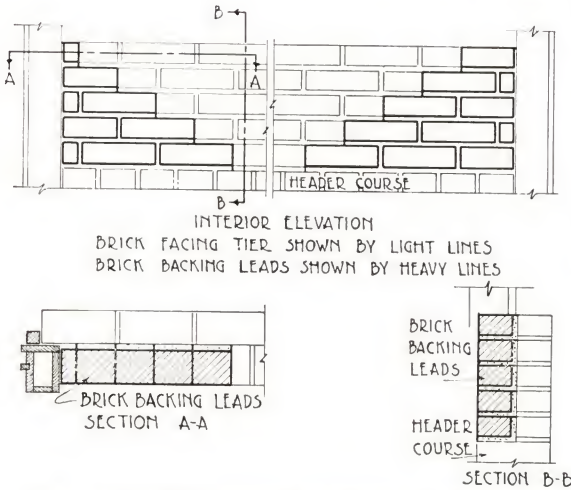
Method of laying up leads on the inside of an 8-inch wall.
